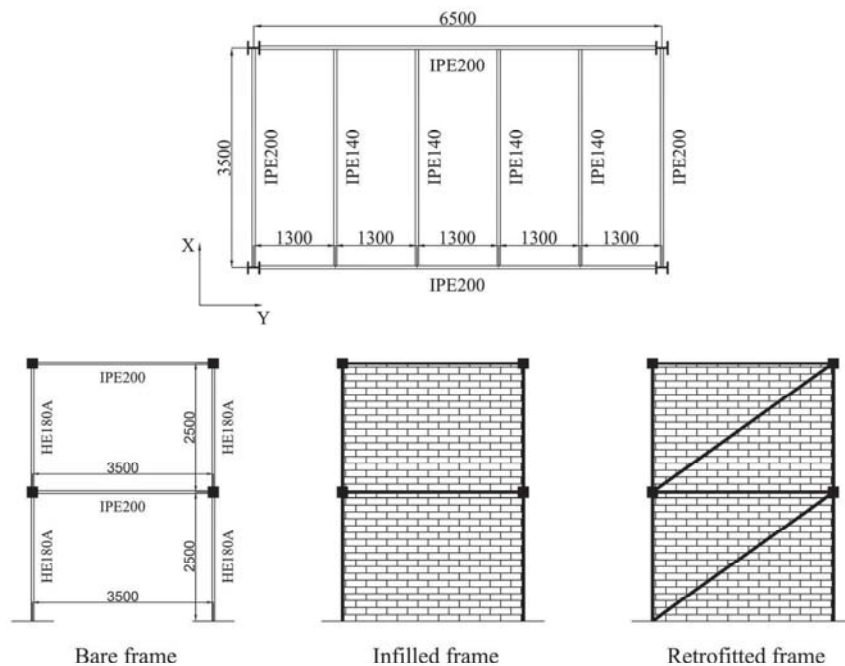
Plan view (top) and side view (bottom) of the test frame with different configurations (unit: mm).
